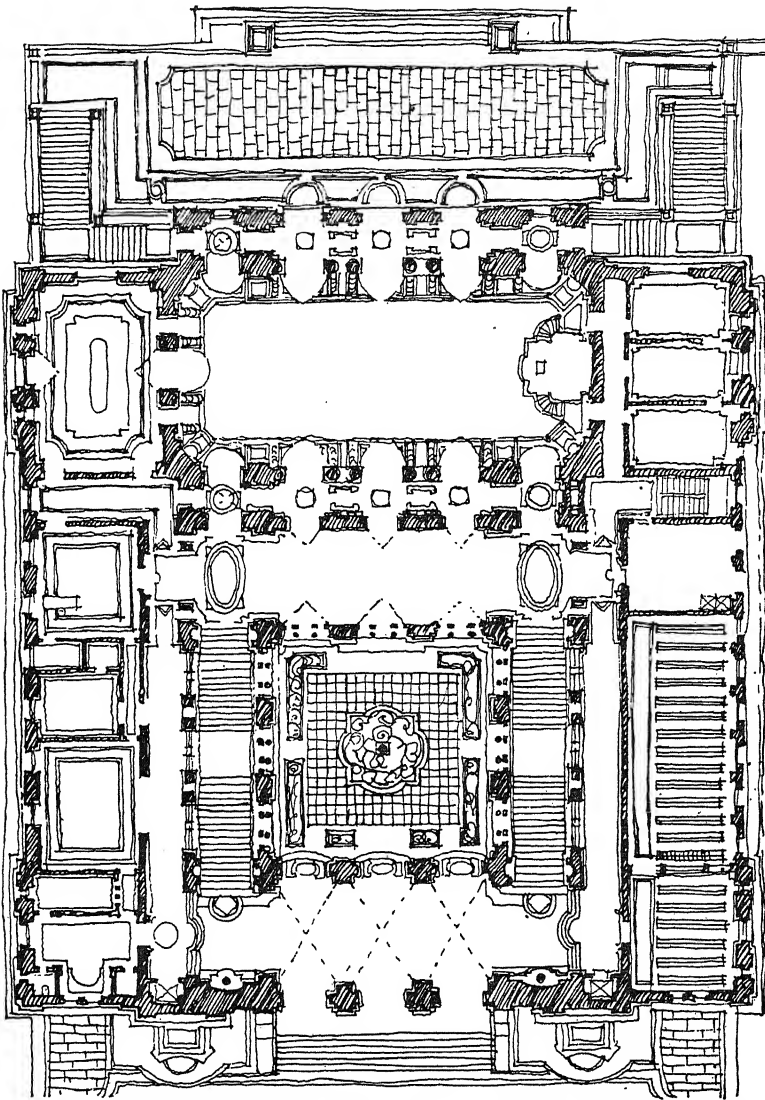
The finished plan of the Pan-American building, Washington, based in its main lines upon the original sketch solution.
